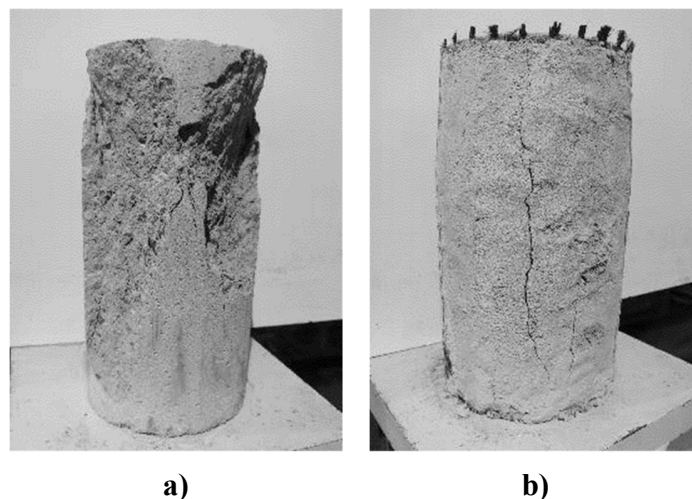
Failure mode: a) specimen CCL0D0-1, b) specimen CCML1D0-1
